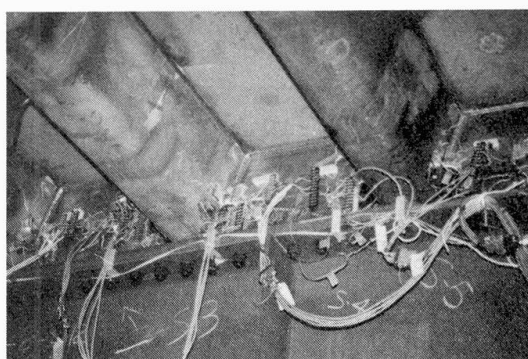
Typical diaphragm of the full-scale test showing strain gage locations near the rib connection.
